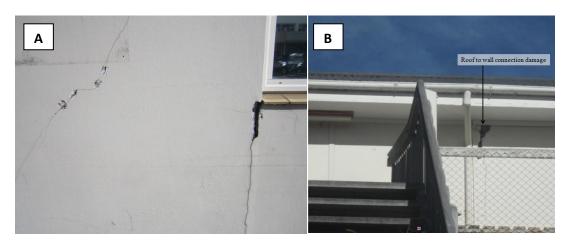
(A) Akroa Hospital Structural cracking (B) Akaroa Hospital Structural damage roof wall conection
